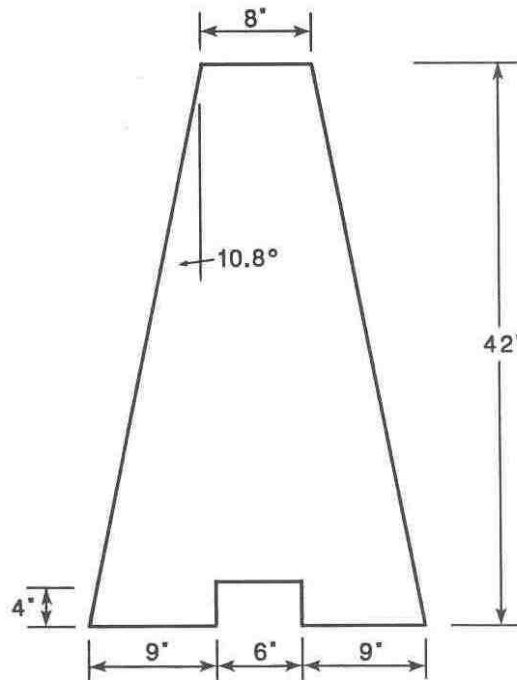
Cross Section of Single Slope Concrete Barrier.
